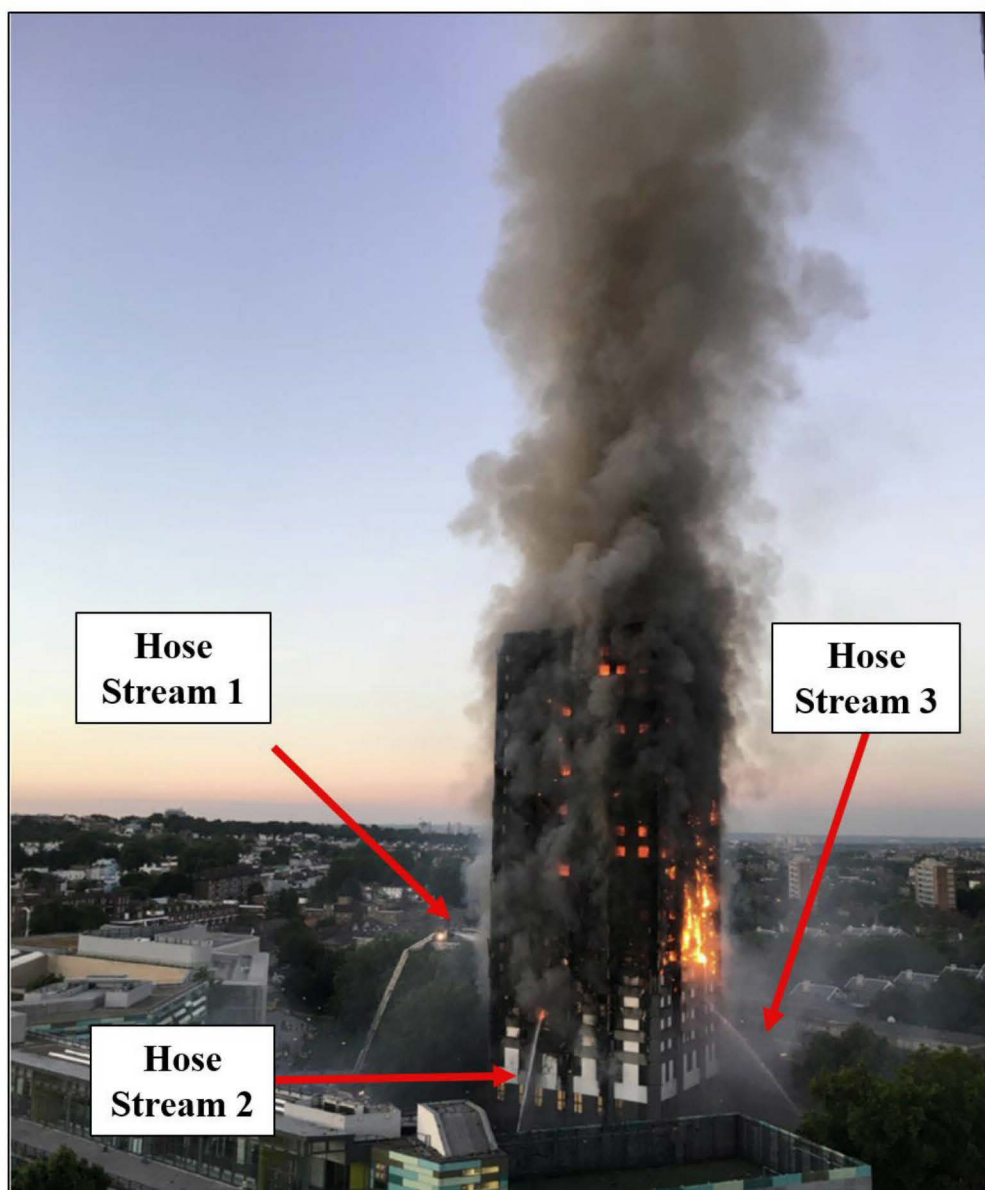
Firefighting jets on building envelope - East, North, and West elevations - at 04:43 on 14 June 2017 (MET00012593)
